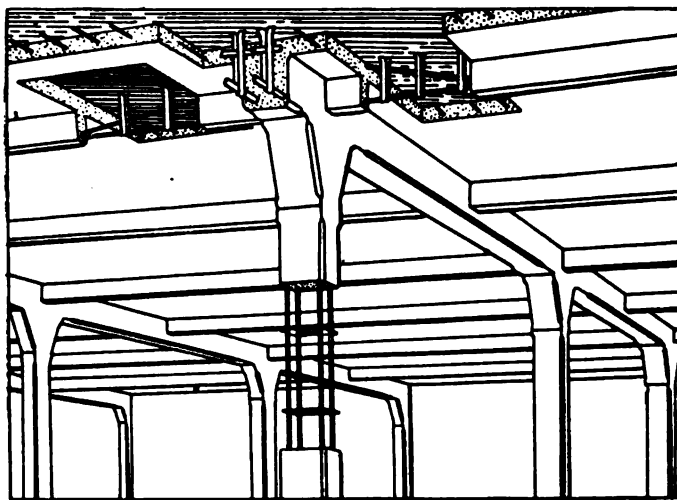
Pillars, Beams, and Floor in Ferro-Concrete.
